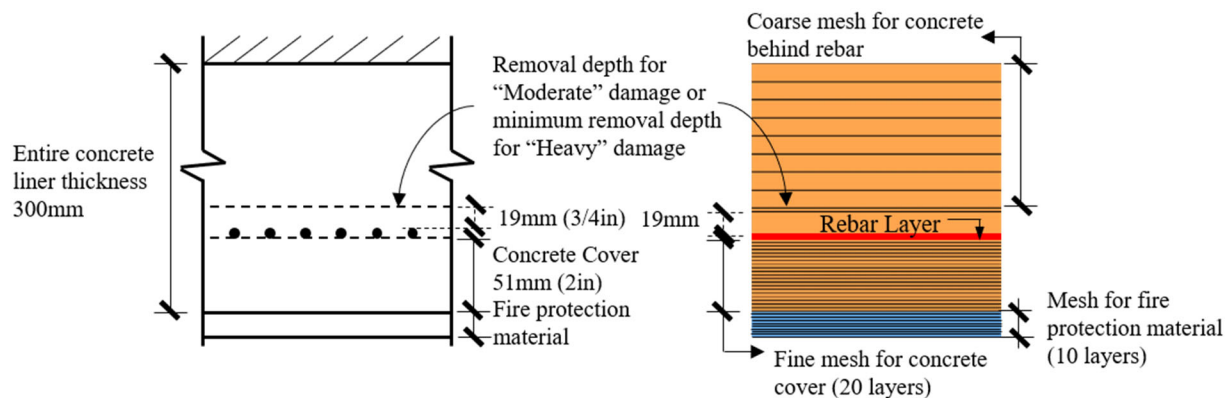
Prototype concrete tunnel liner geometry and fiber model
